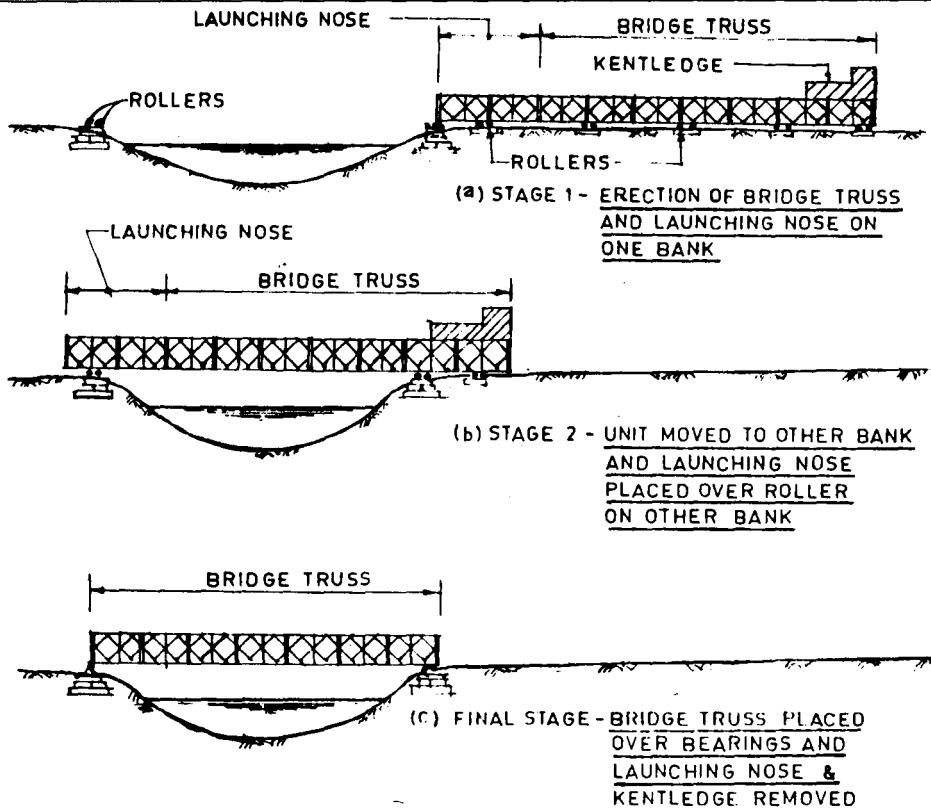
ERECTION AND LAUNCHING OF PORTABLE STEEL BRIDGES (BAILEY BRIDGES) (GRSE)<sup>1</sup>
